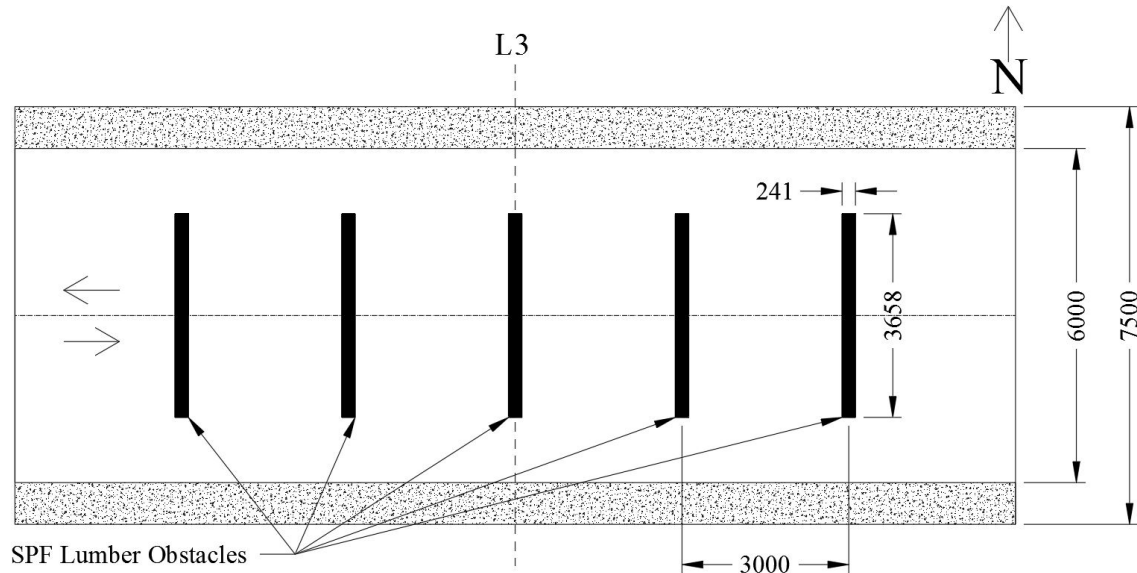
Plan-view of centerline layout for single and double high obstacles (all dimensions mm).
